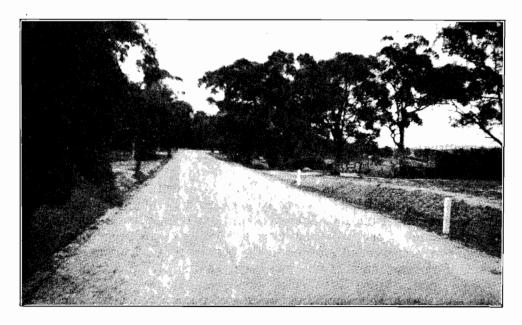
Showing section of the Midland Highway between Buninyong and Ballarat.
